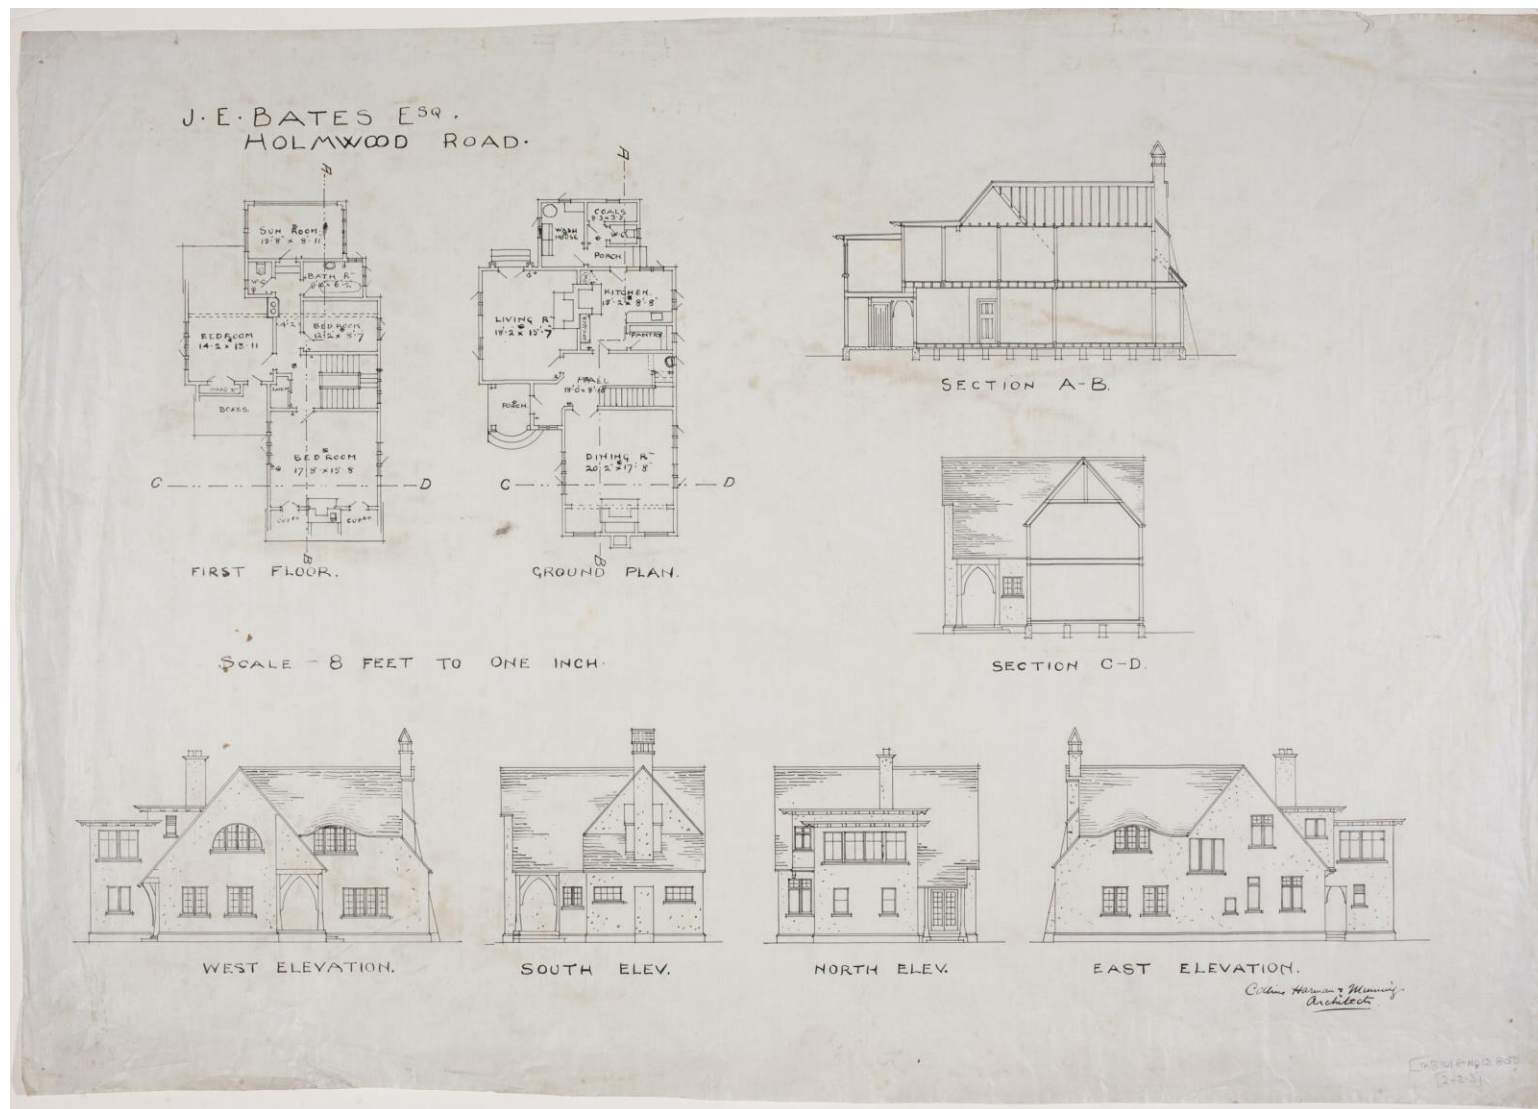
Collins, Harman and Munnings, J. E. Bates, Esq., Holmwood Road, plans, elevations and sections (1919).
